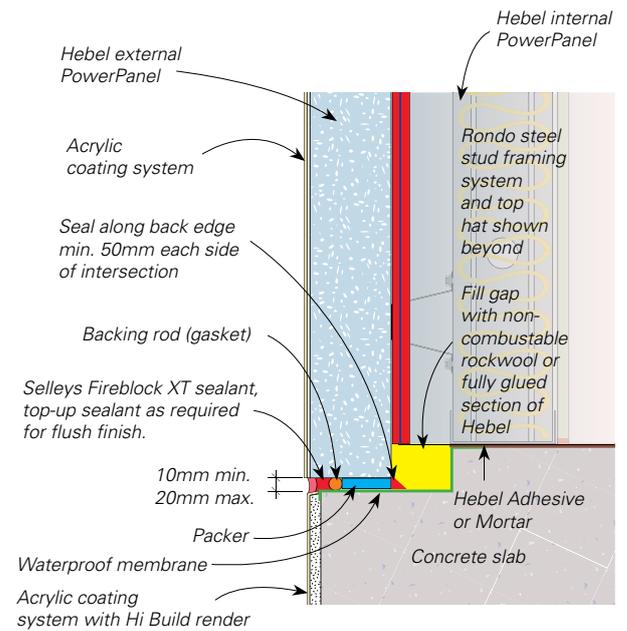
Section AA Hebel facade to Hebel internal wall junction
